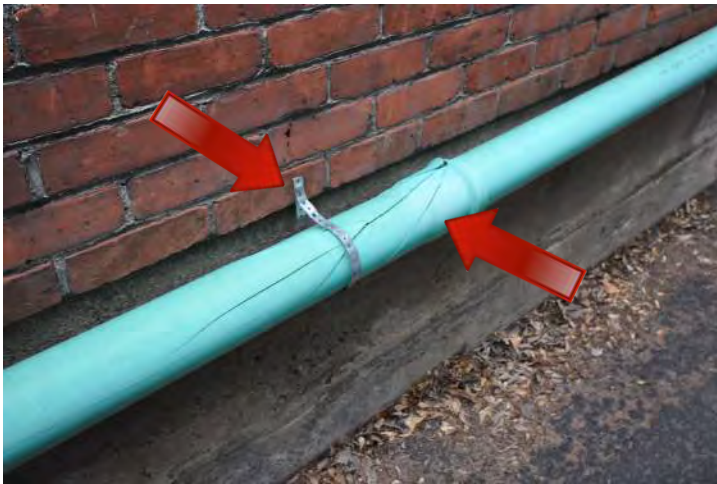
Similar to Figure 43, this stormwater drain pipe has shattered, likely due to freeze/thaw cycling of water that is not draining properly. This pipe should be repaired immediately to prevent further building damage, including anchoring the pipe into a masonry joint or the concrete foundation wall below.
